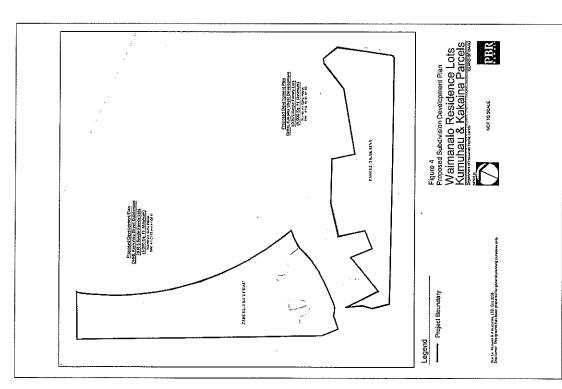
Project Area Plan View May Showing Proposed Development Plan, for Parcel 1 and 2.
